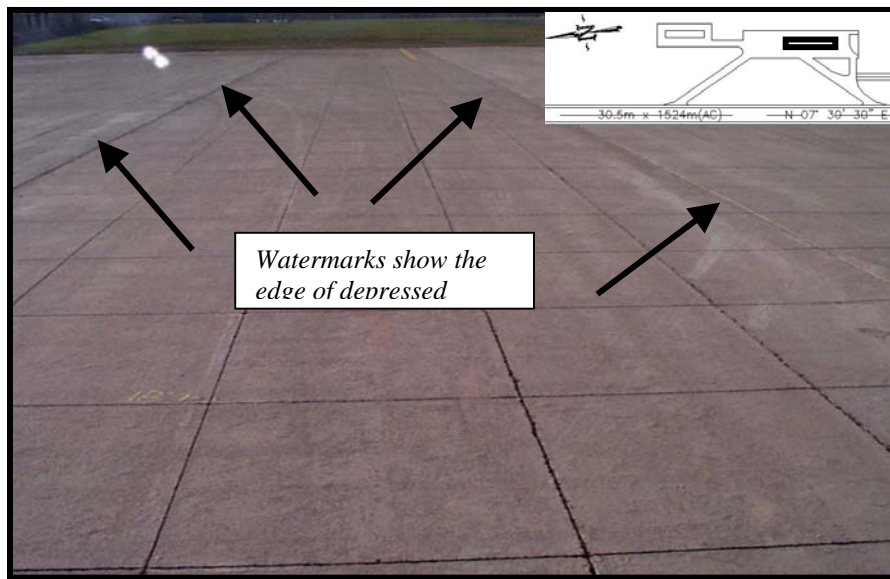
Poor subgrade support caused depressions in SNH apron pavement.
